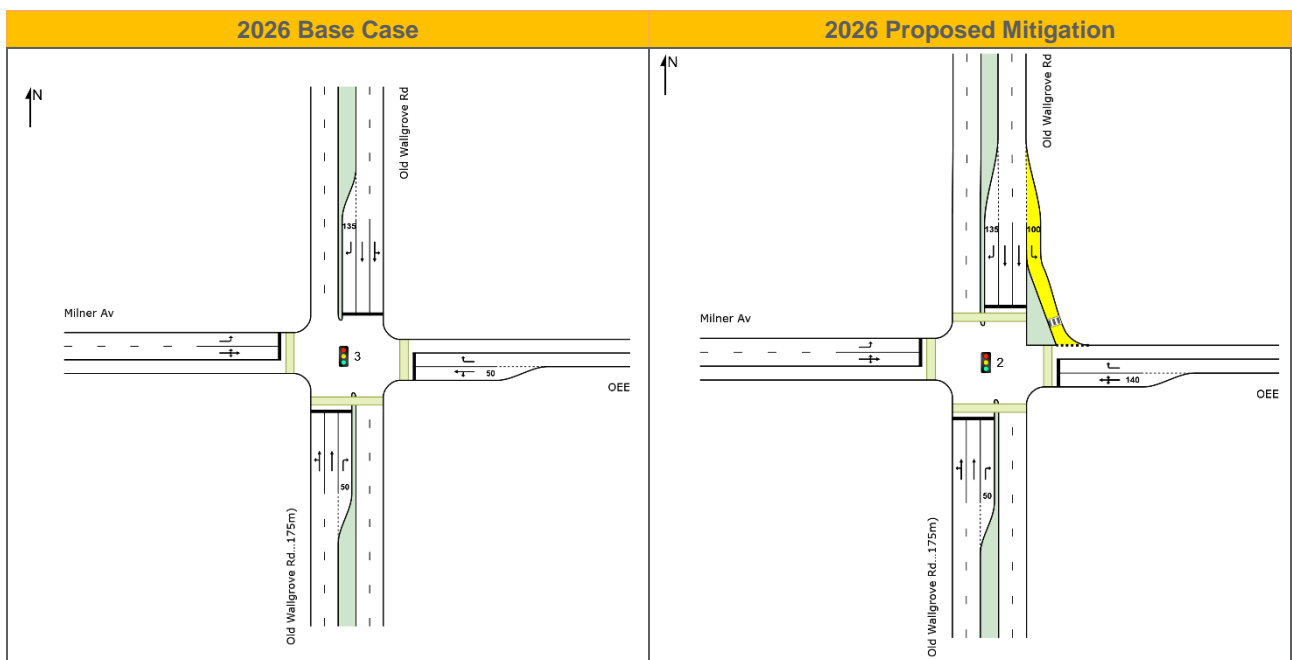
Old Wallgrove Road / Millner Avenue intersection Mitigation
